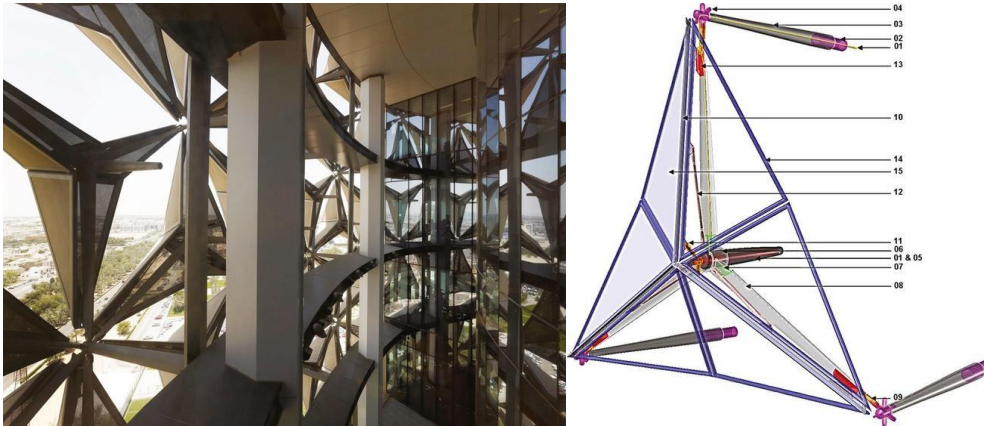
The floppy anti-flare interface at a distance from the outside of the building was fitted to a separate frame.
